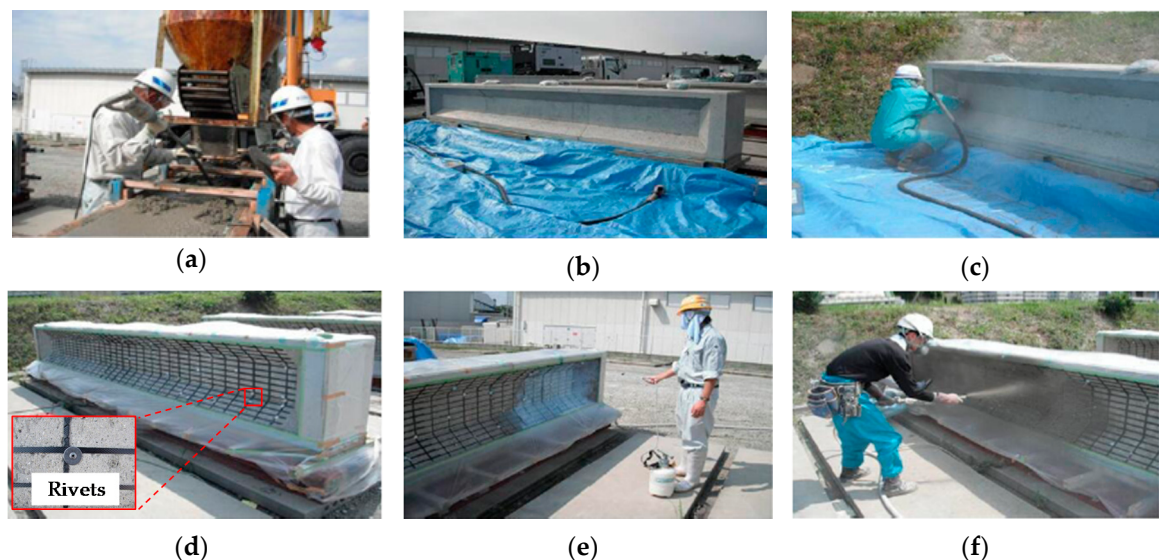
The manufacture process of specimens: (a) Concrete cast; (b) Original concrete beam; (c) Vacuum blast; (d) CFRP grid installation; (e) Primer mortar spray; (f) PCM shotcrete.
